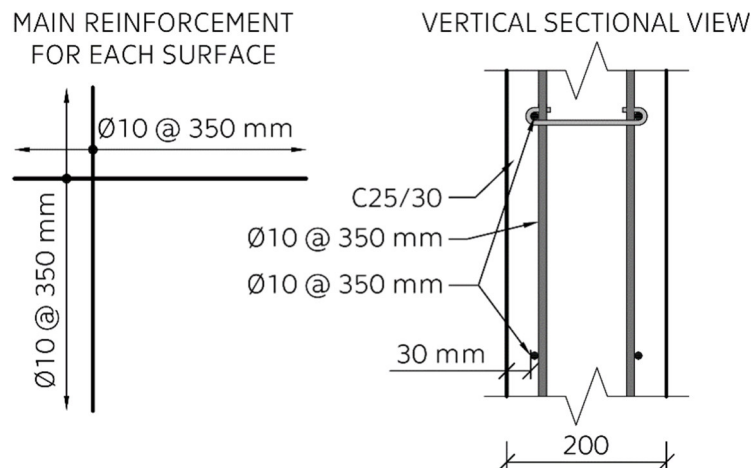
Case study - schematic drawing of reinforcement of concrete walls
